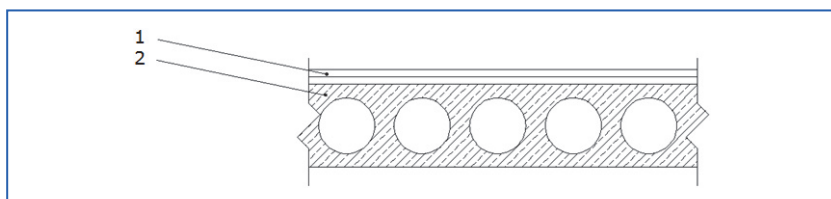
Floor. 1) Wooden floor; 2) 220 mm precast hollow concrete slab.
